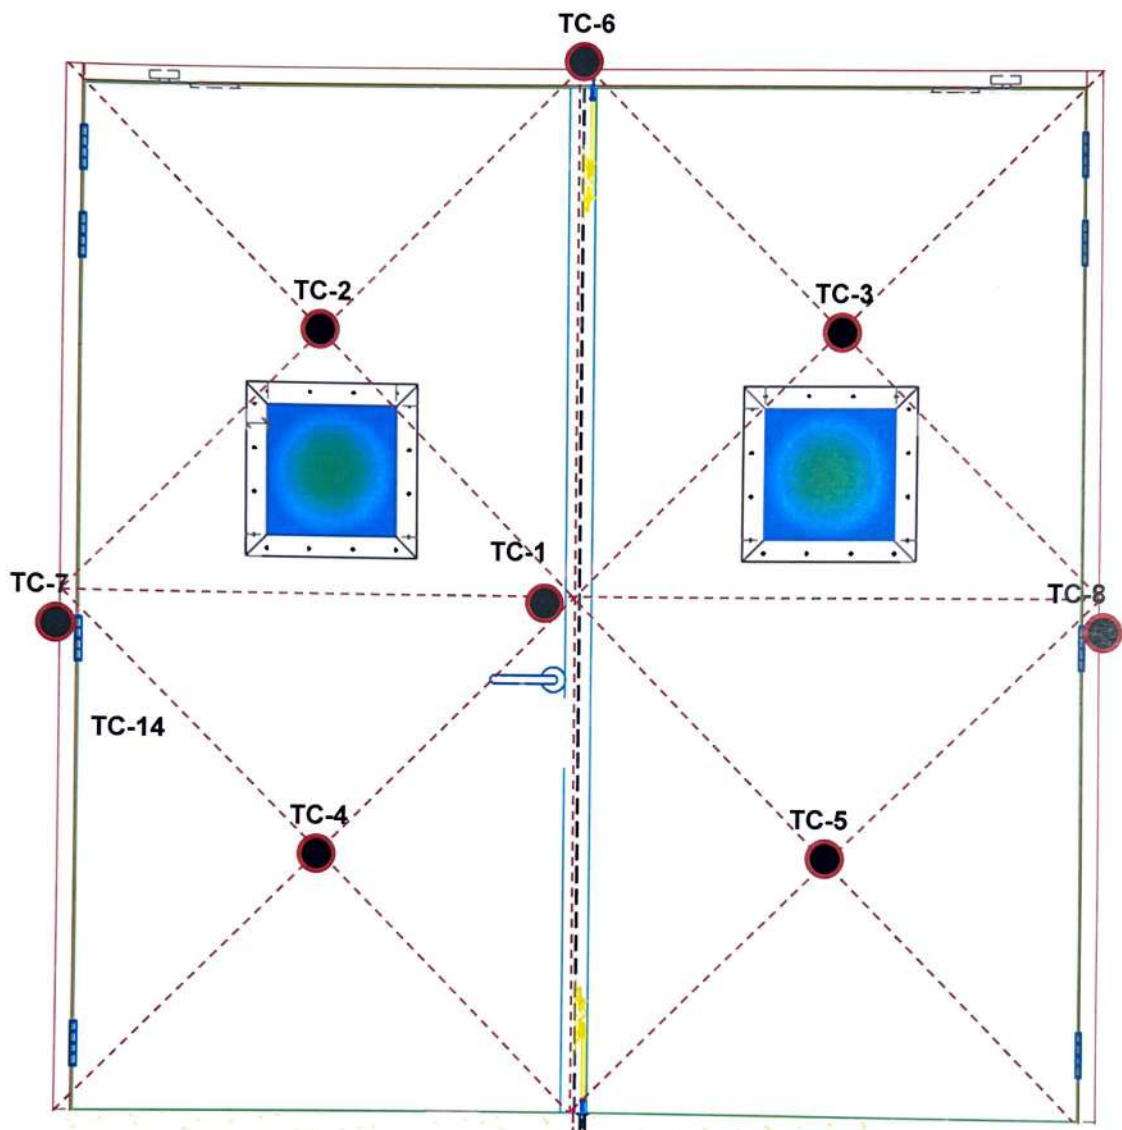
Positioning of thermocouples used to determine unexposed surface of the steel double door.
